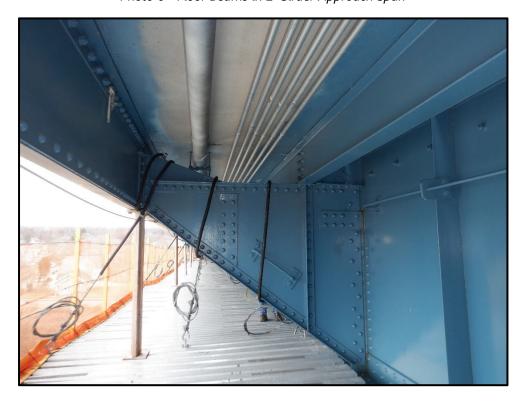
Floor Beam Cantilever Supporting the Sidewalk
